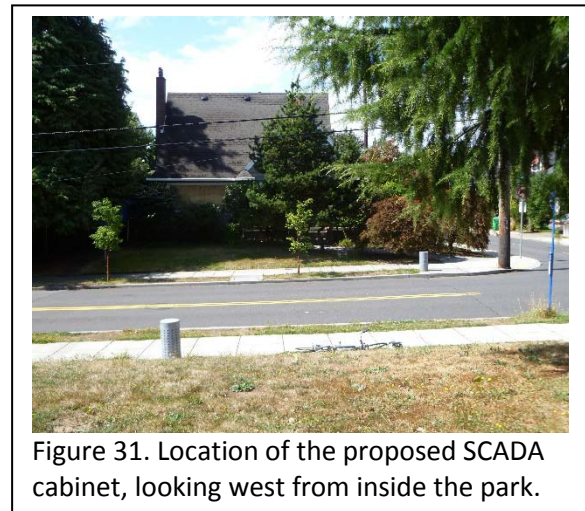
Location of the proposed SCADA cabinet, looking west from inside the park.
